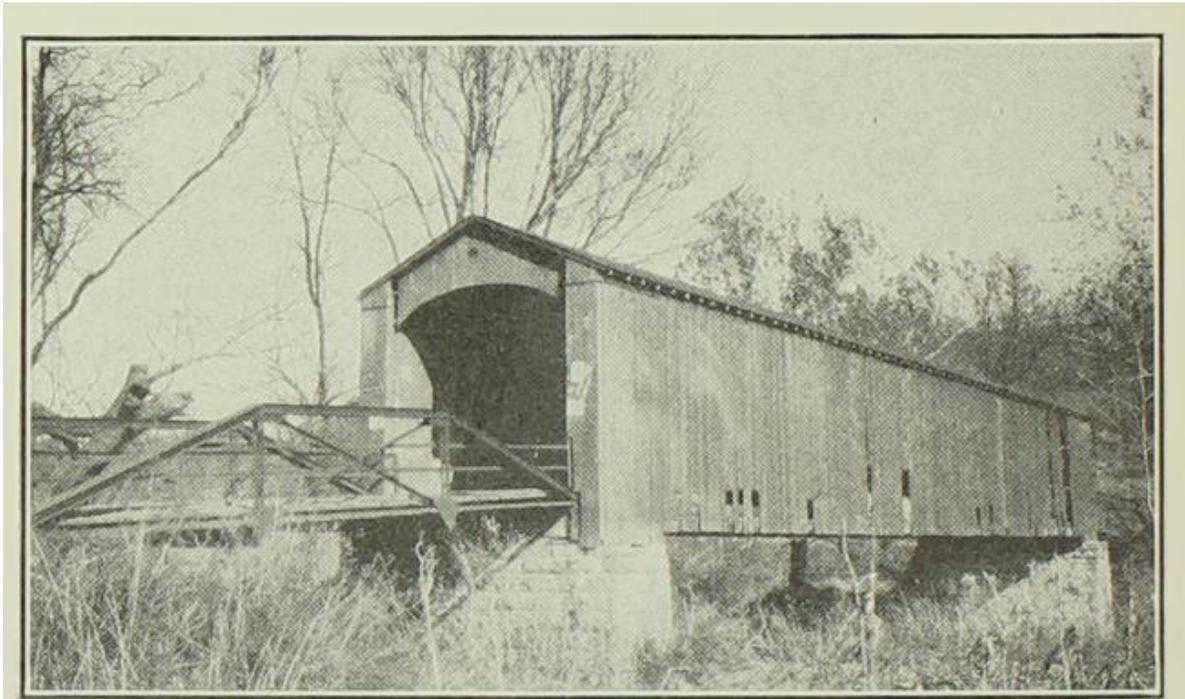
Last covered bridge in Kansas on Highway 92 west of Leavenworth (replaced in 1929)
